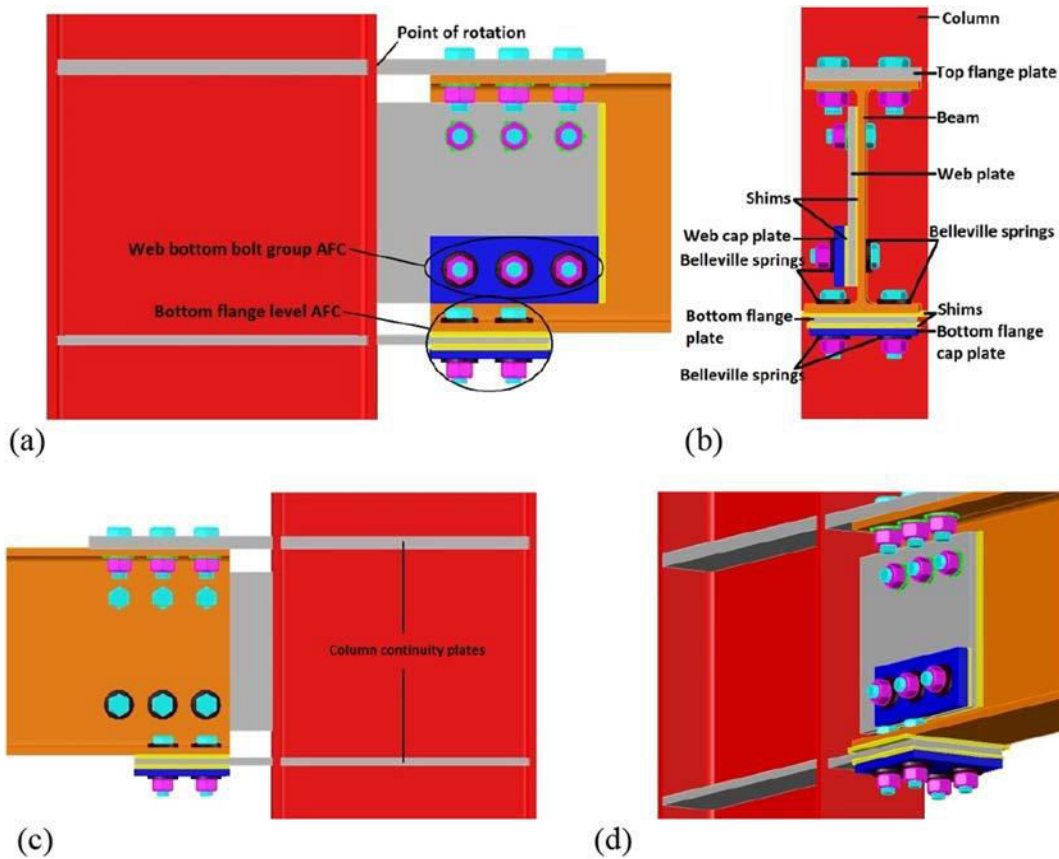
The sliding hinge joint (SHJ) views (a) front (b) beam cross sectional, (c) back, and (d) 3D [6]
